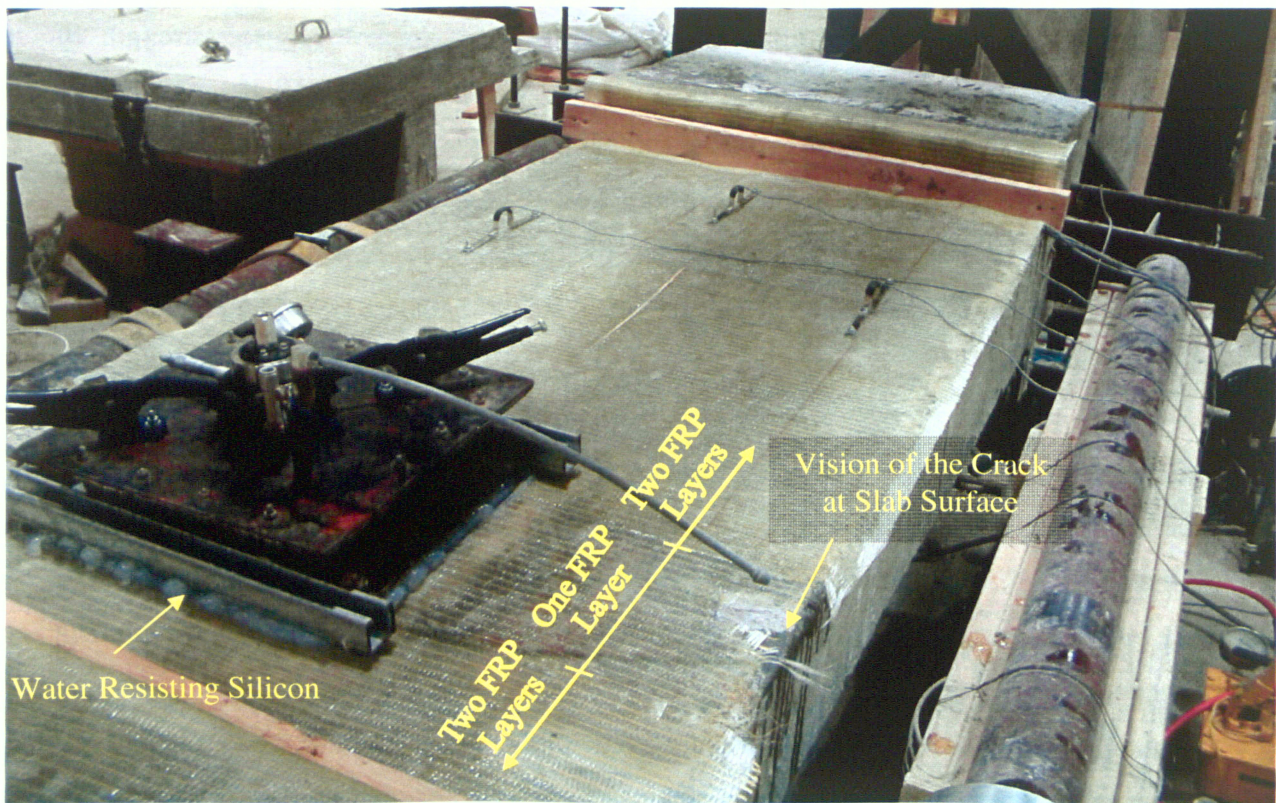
Test set-up and FRP layers for the forth phase of direct tension test
